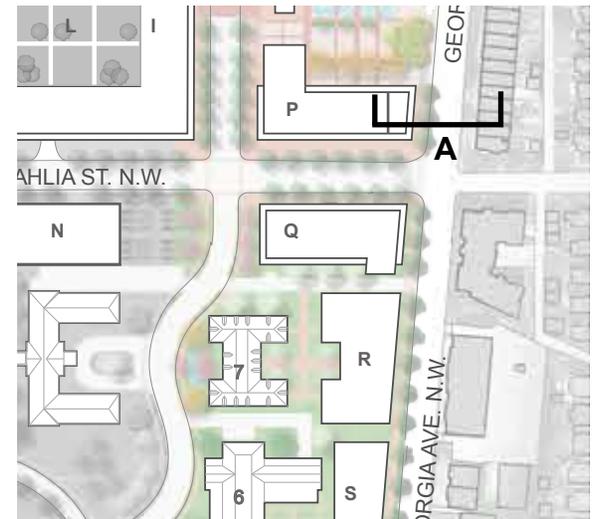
Street Sections Key Plan - Georgia Avenue. Source: Perkins+Will
